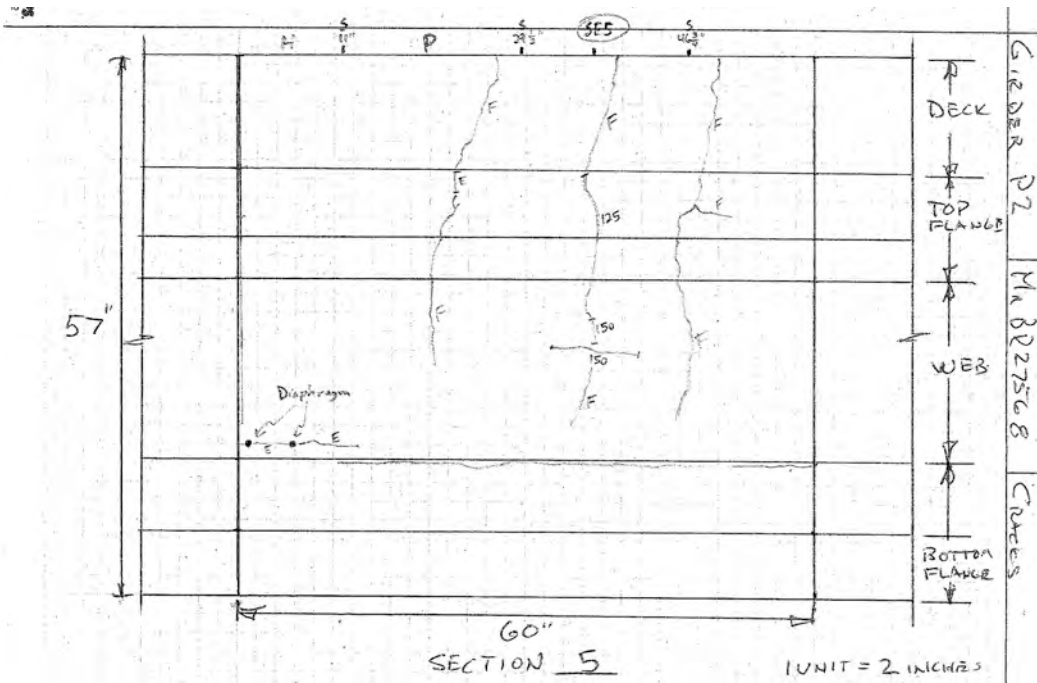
Girder P2 crack pattern – Section 5
